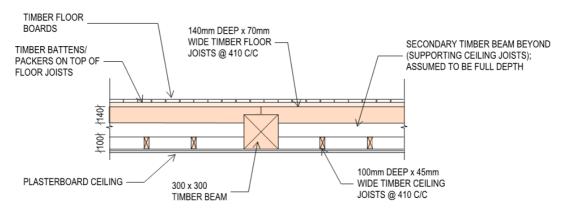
Typical arrangement of primary and secondary beams and floor and ceiling joists
